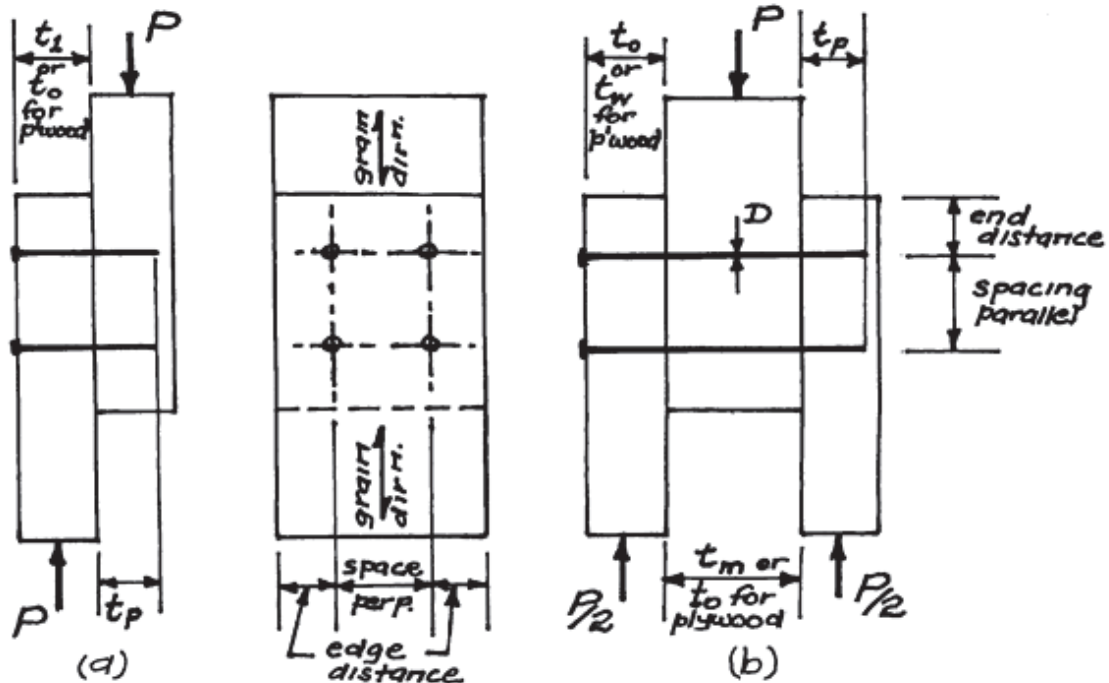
Two and Three member Type 1 nailed and screwed connections
